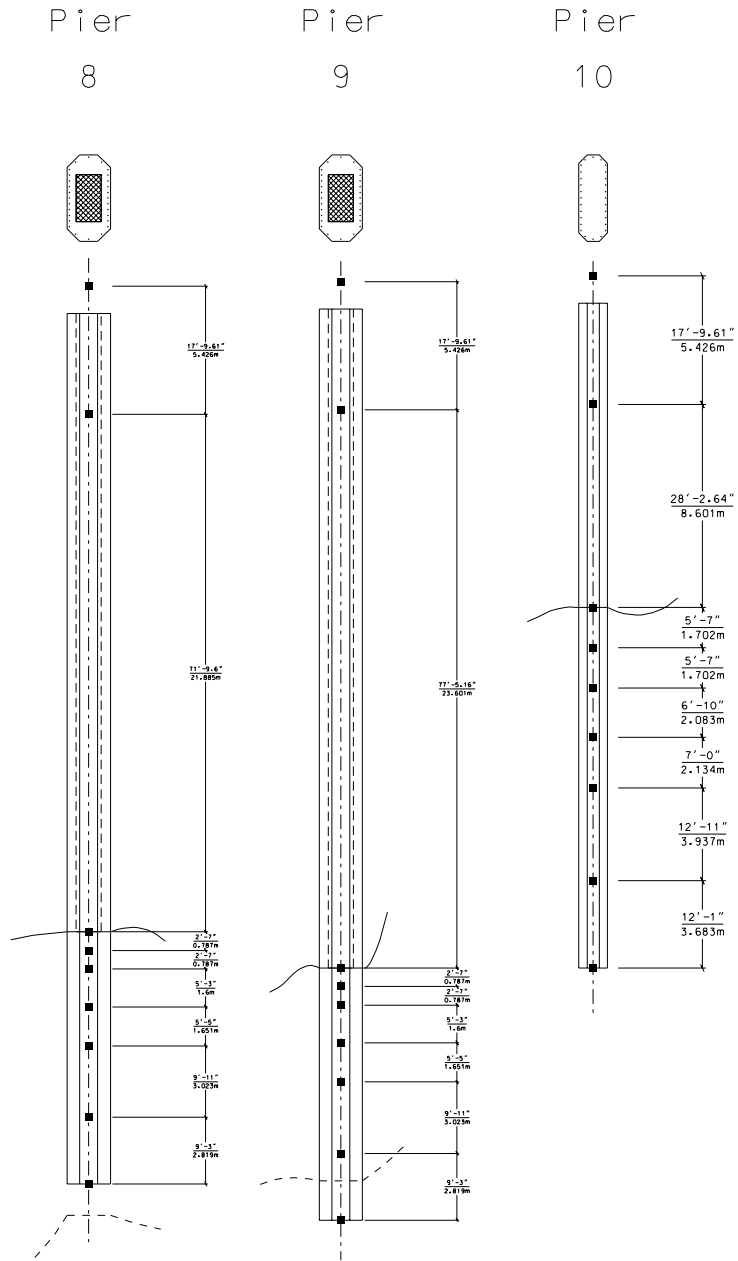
Node Locations in Column Elements for Piers 8, 9 and 10
